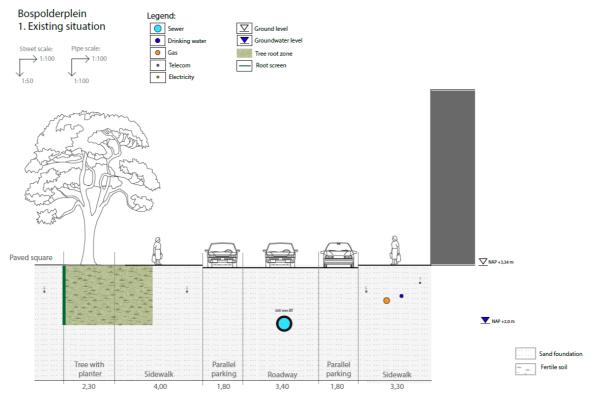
Cross-sectional view of the Bospolderplein-street – Situation 1: existing situation
